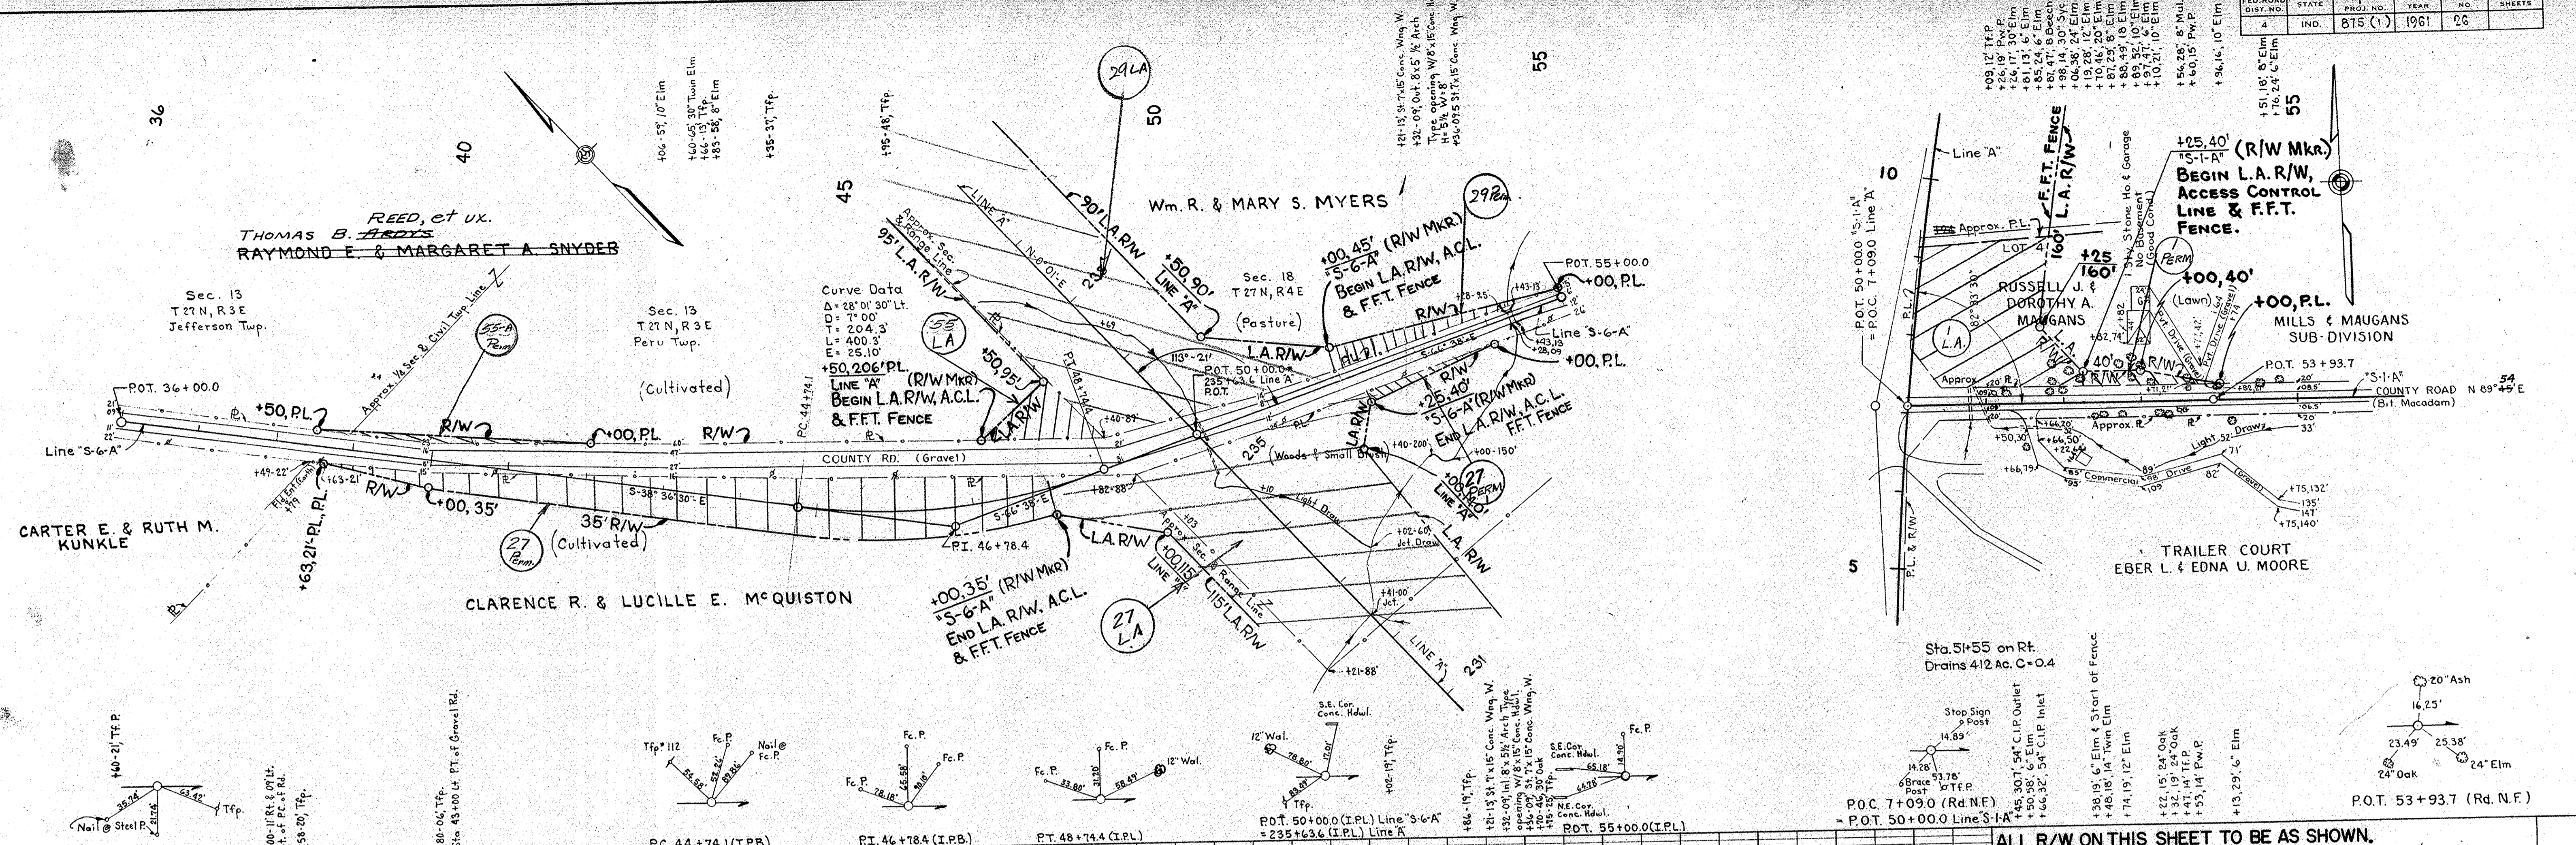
PLAN - PROFILE H. R. R. STANDARD
